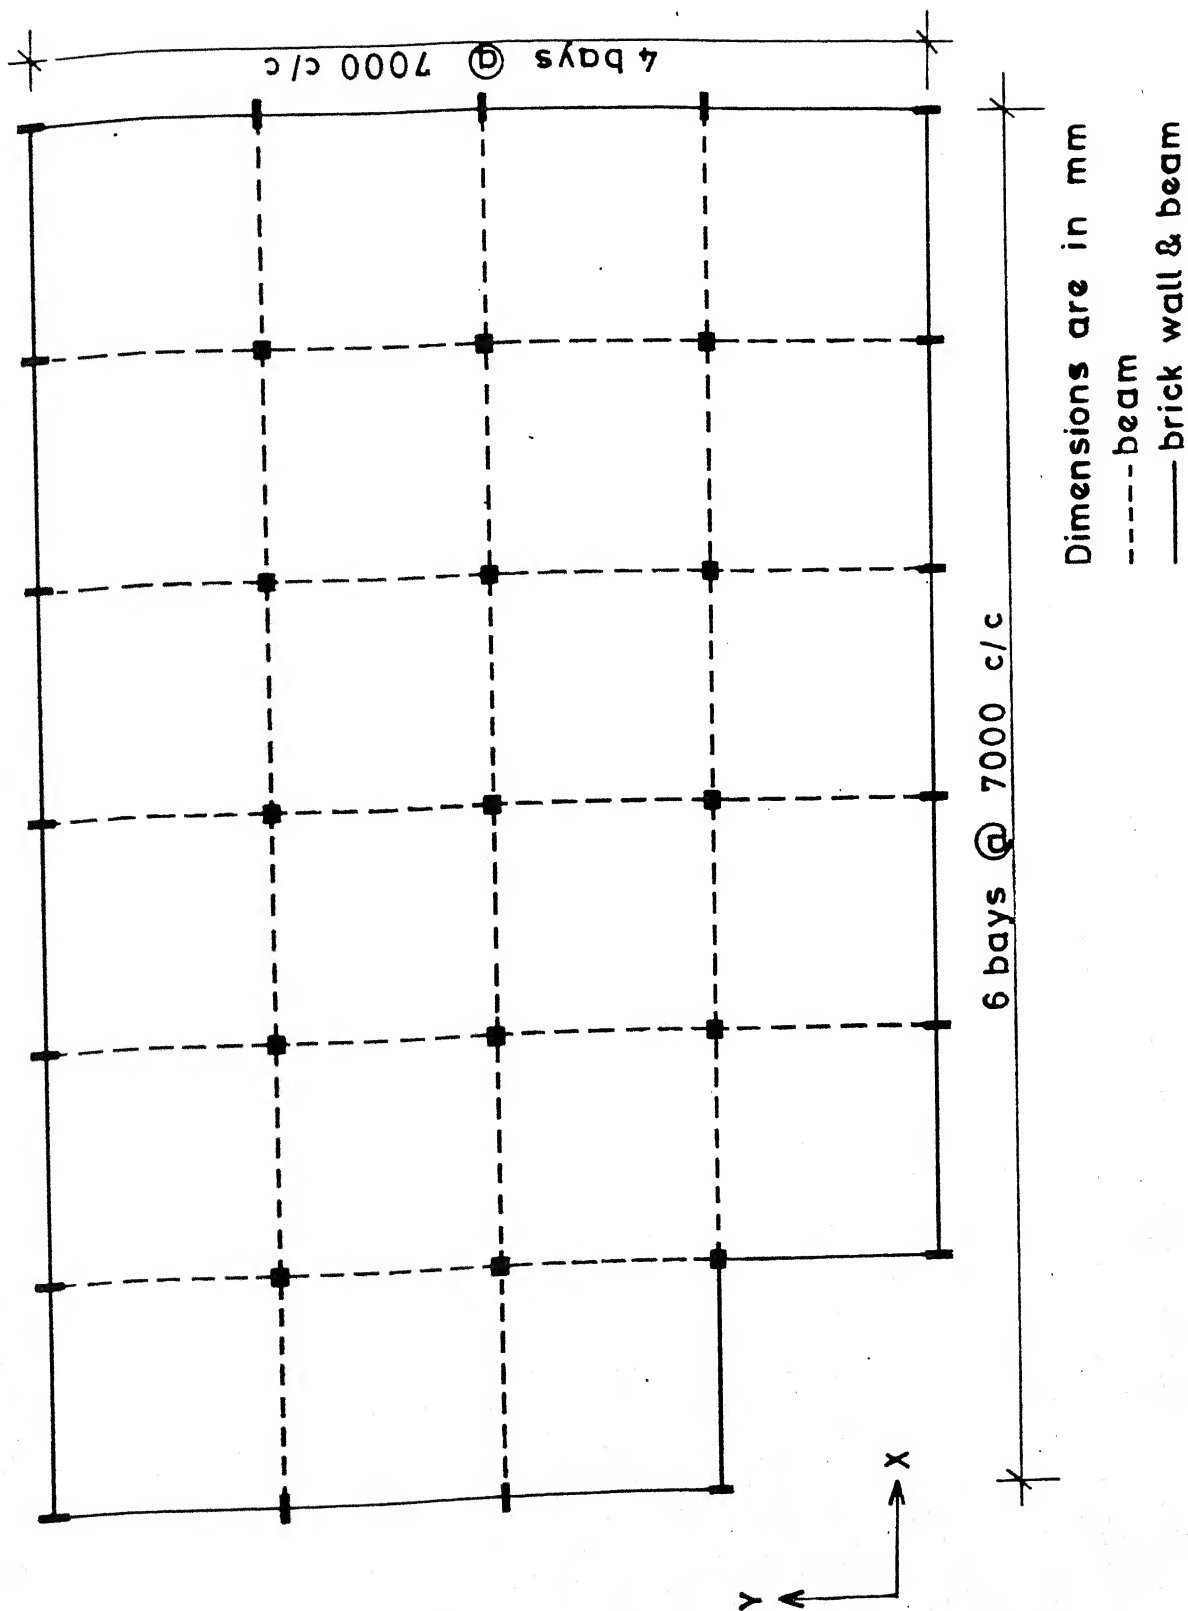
FLOOR PLAN FOR THE INDUSTRIAL BUILDING.
